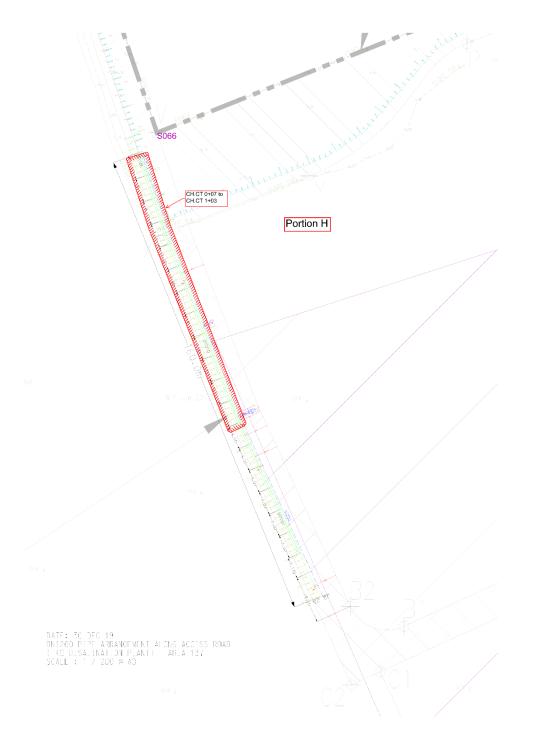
Location Plan for CH.CT 0+07 – 1+03
